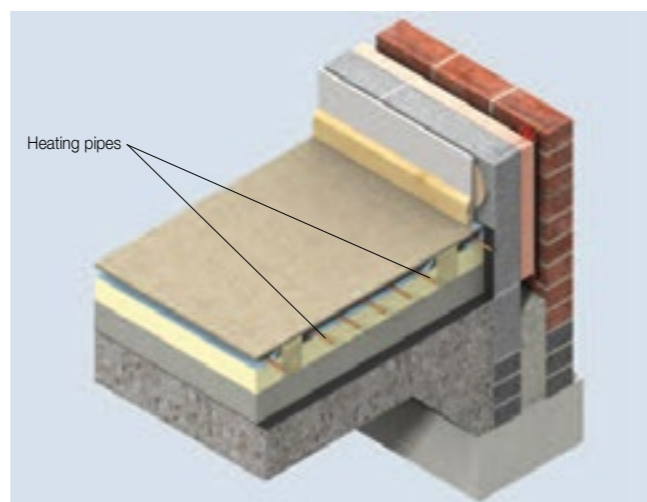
Intermittent Heating Applications – Timber Floor on Battens
